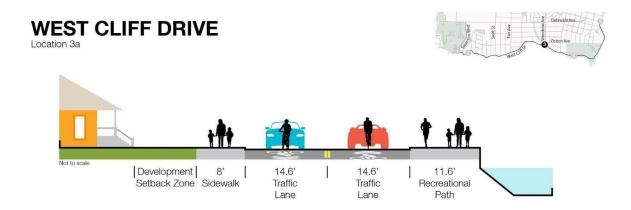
Cross Section of West Cliff Drive Alternative 1 Enhancements Just west of Woodrow Ave.
